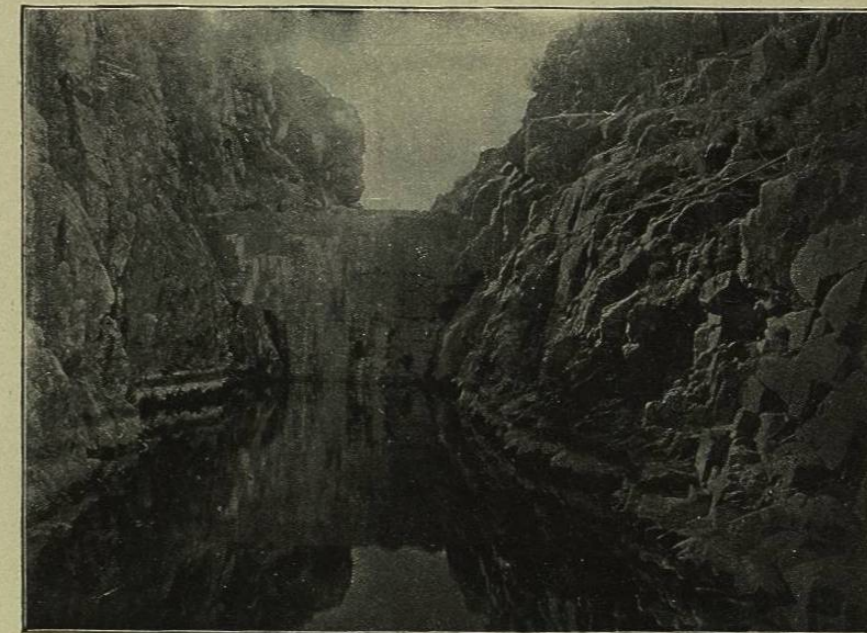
UPPER OTAY DAM. FOUNDATION MASONRY.
